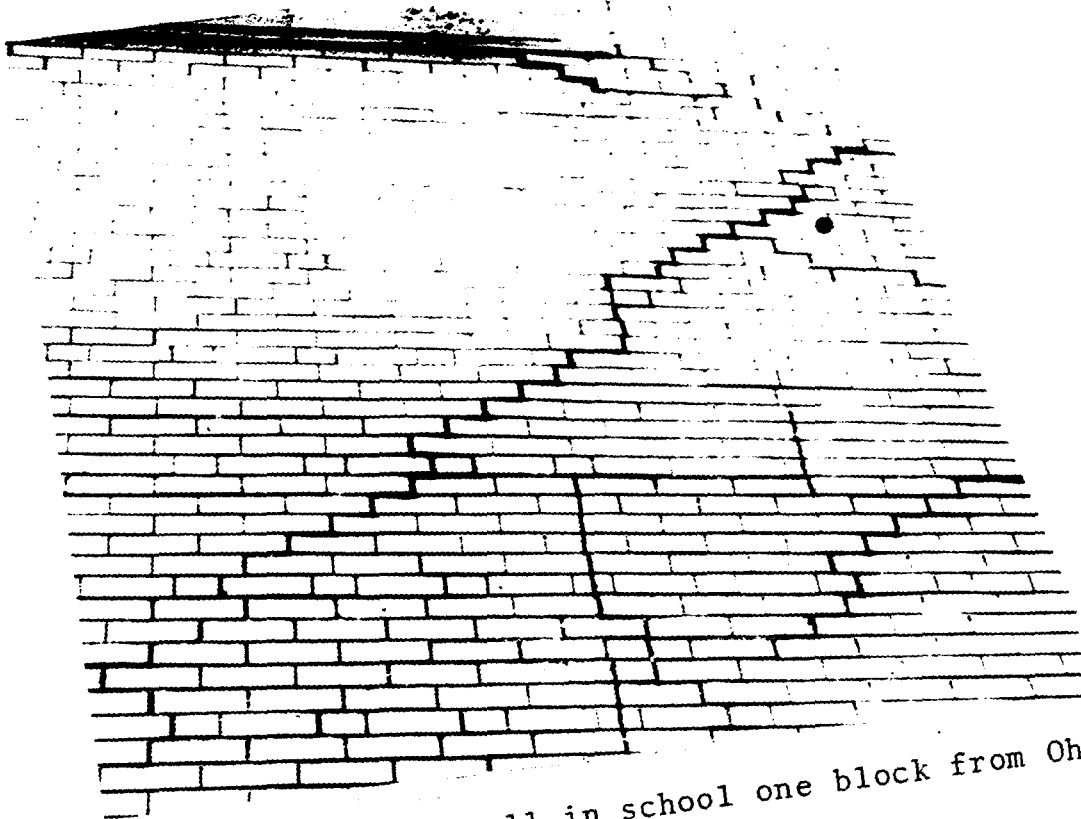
Cracked brick wall in school one block from Ohio River in Aberdeen, OH.
